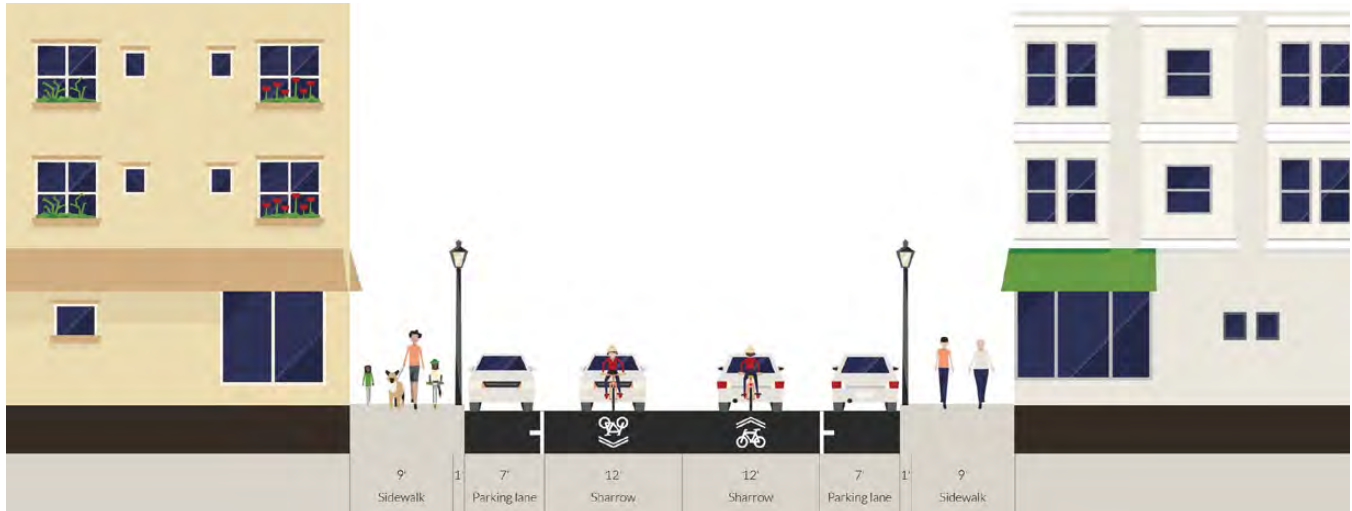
Cross Section: Union St. (Downtown Boundary)
